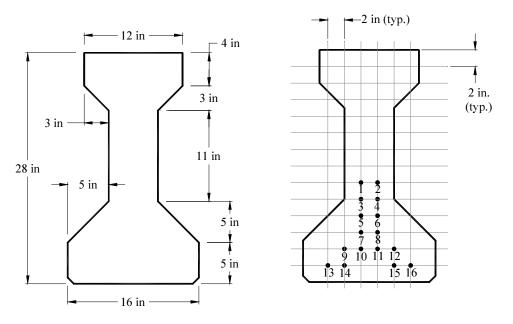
AASHTO Type I Cross Section and Strand Pattern for 20-ft Beams
